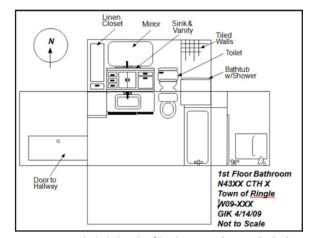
Exploded sketch of bathroom. The exploded view shows a floor plan with walls laid out flat. Objects on the floor and on walls, such as bullet holes or bloodstains, are shown in their relative positions in the exploded view sketch.
